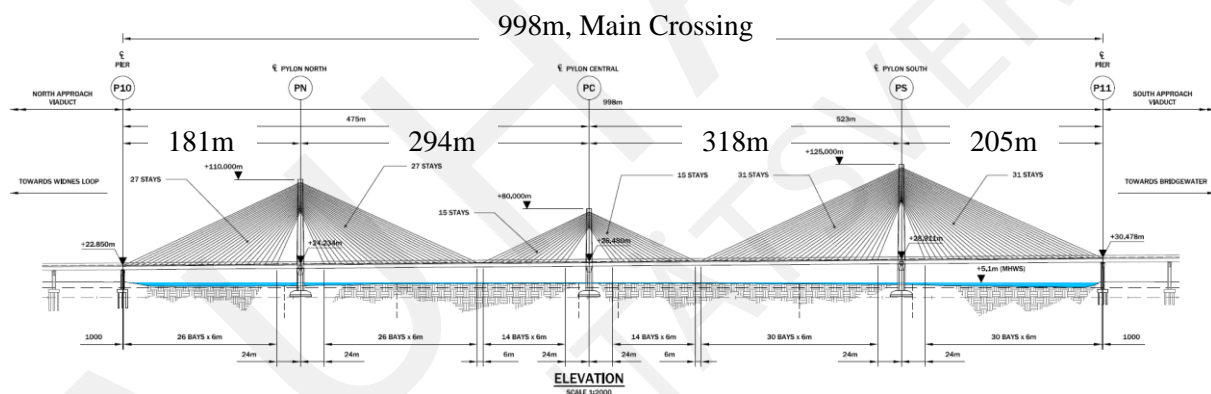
Mersey Gateway Bridge main crossing: Structural drawings.
